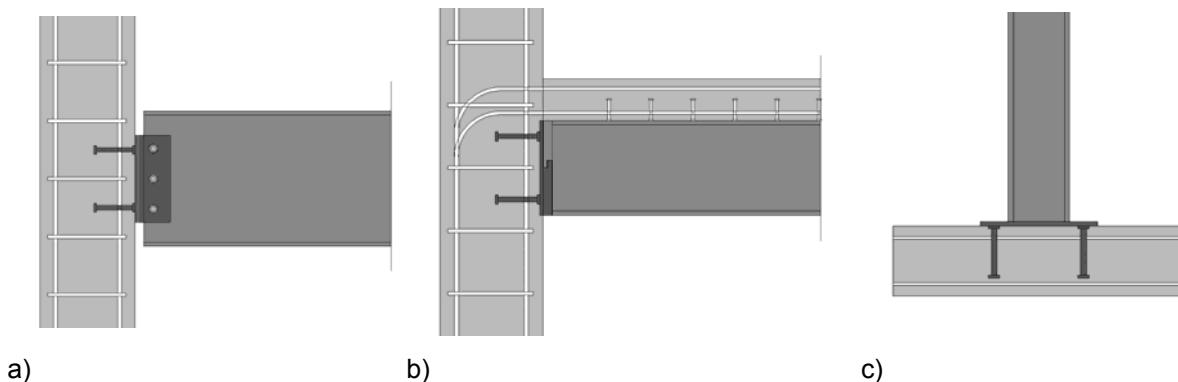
Examples for steel-to-concrete joints, a) simple joint, b) composite joint, c) column bases
